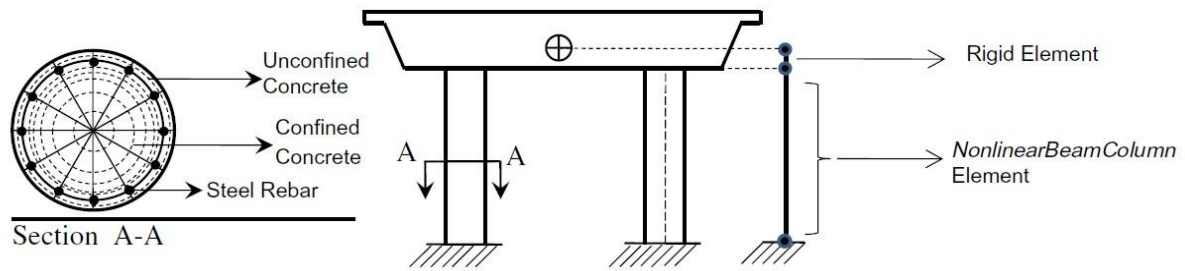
Column modeling scheme for Bridge B [Kaviani et al. 2014].
